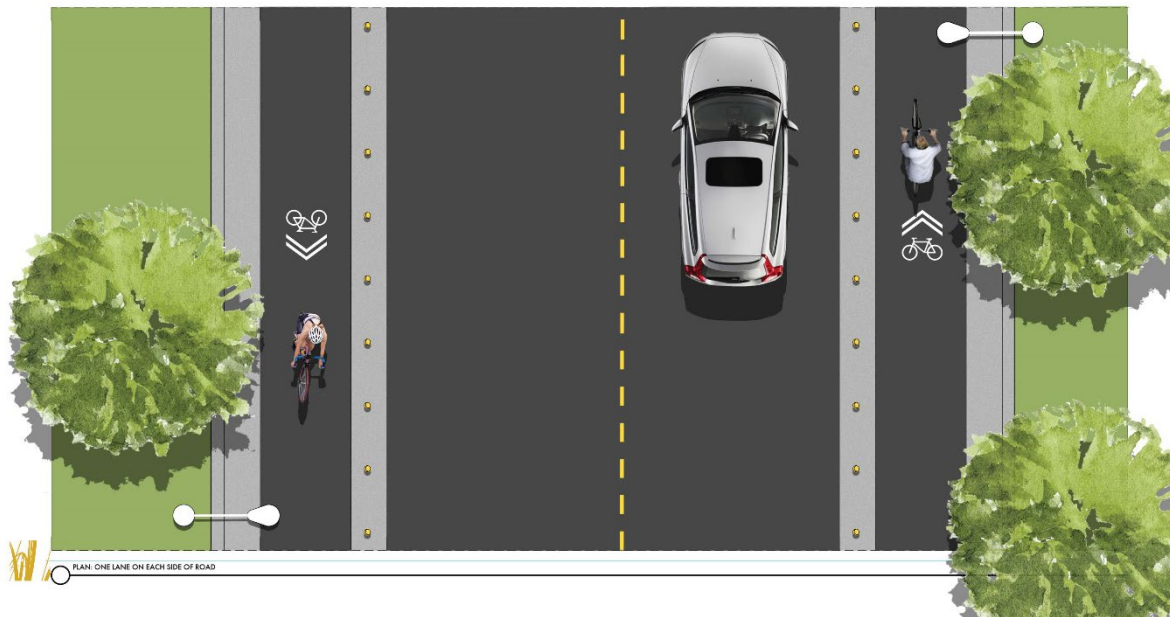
Bike lane along traffic lane, each side. Sidewalk could be constructed behind curb. (Tallgrass Landscape Arch.)
